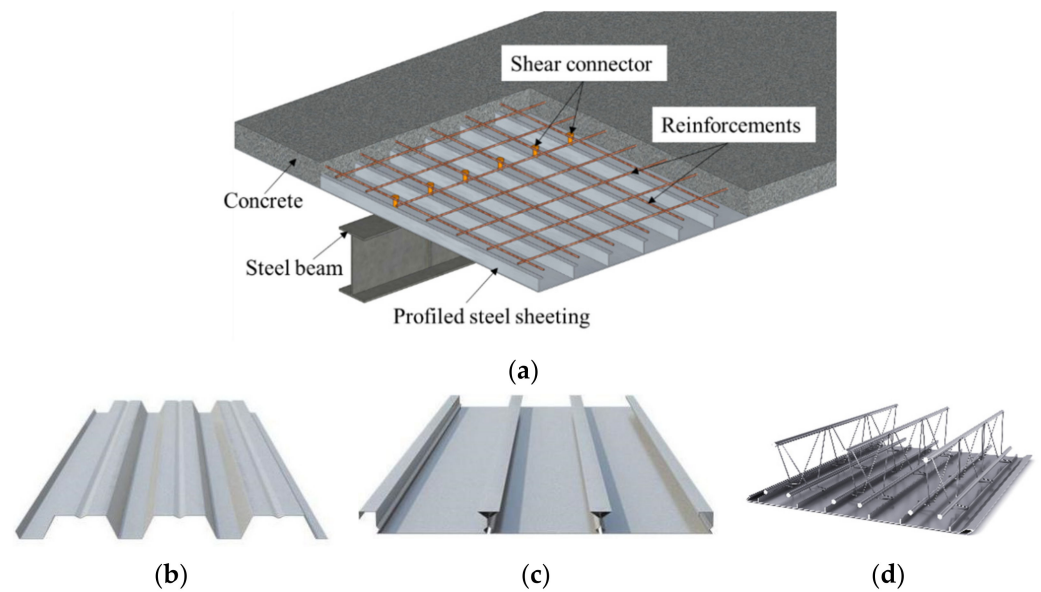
Typical composite steel–concrete beams with (a) a schematic of composite steel–concrete beams using composite slabs, (b) an open-trough deck, (c) a clip-pan deck, and (d) a steel-bar truss deck.
